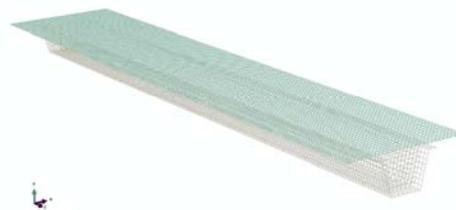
Finite Element Model of Composite Press-Brake Tub Girder Specimen
